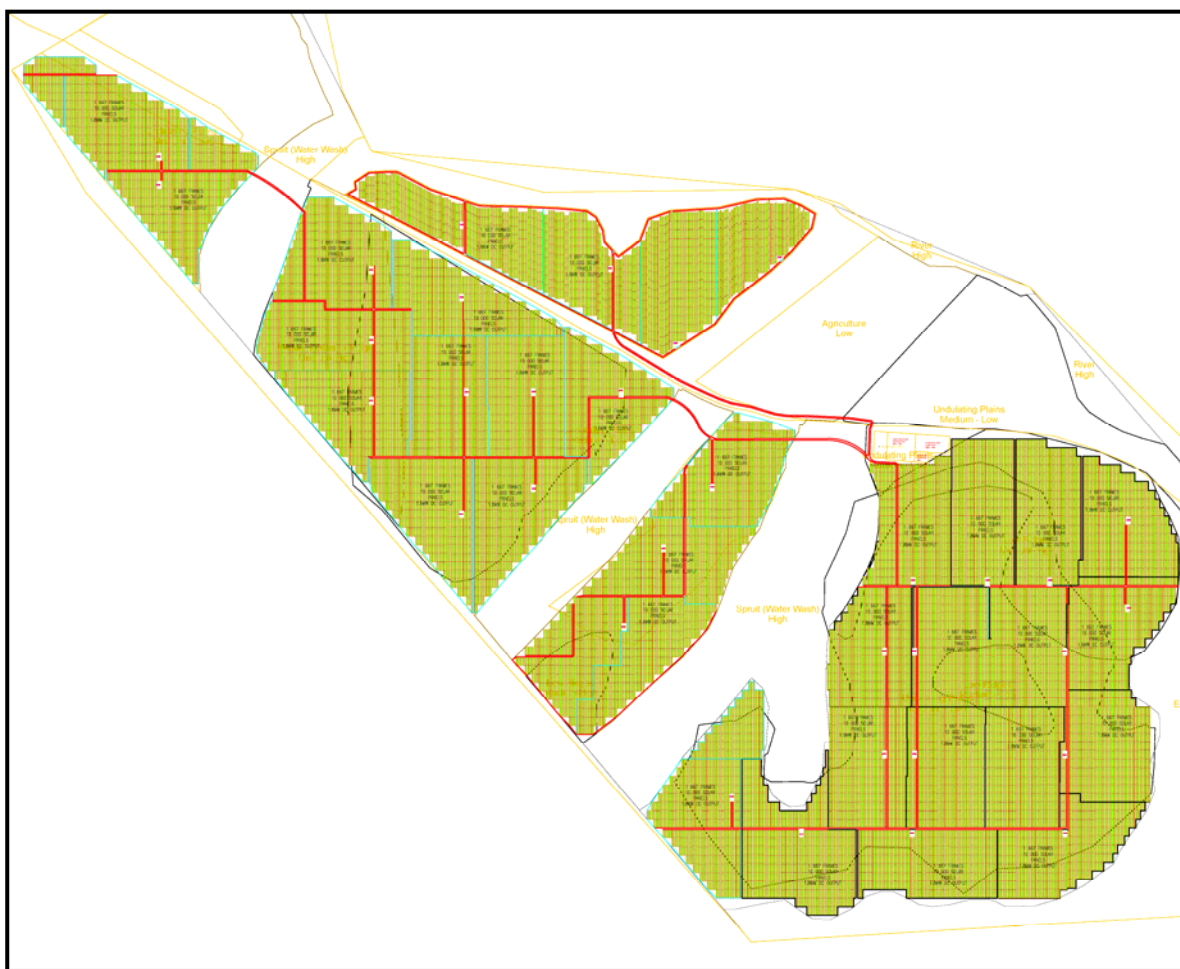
General arrangement of layout alternative 2 (Drawing number P8801 - ELE - GA - 01 - SHT1 - PRE - 00, Appendix G)
